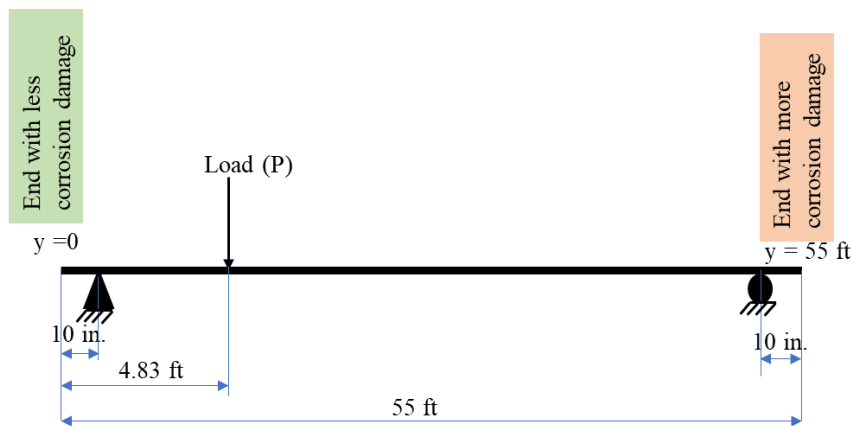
Test Setup for Test-1 on Aden Road Bridge Box Beam-3
